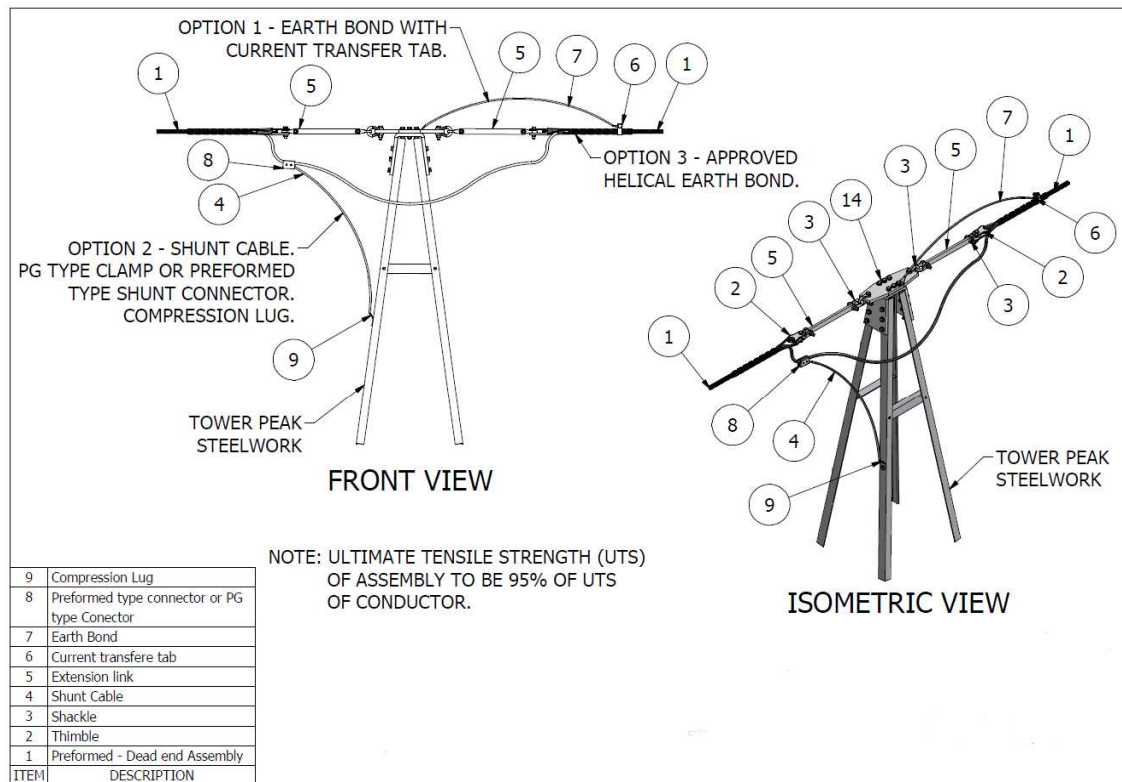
OPGW non-insulated strain assembly at splicing tower
